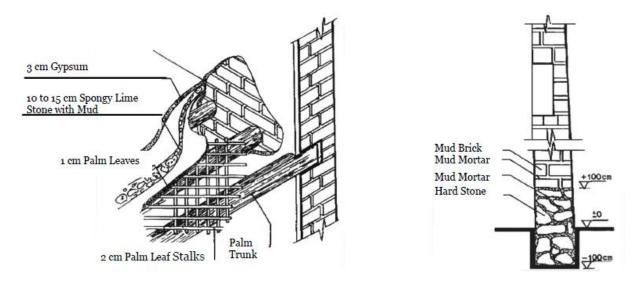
Perspective section in roof and section in wall, foundation Source: Ghadames website, 2009, Eltrapolsi, 2016
